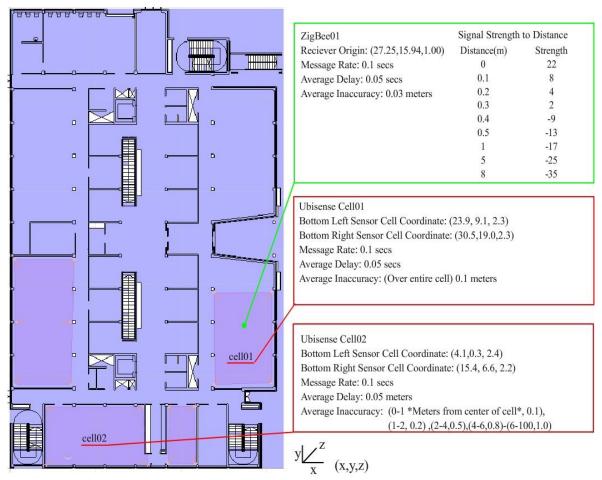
Virtual Reality Building Floor plan with Context Source Info.
